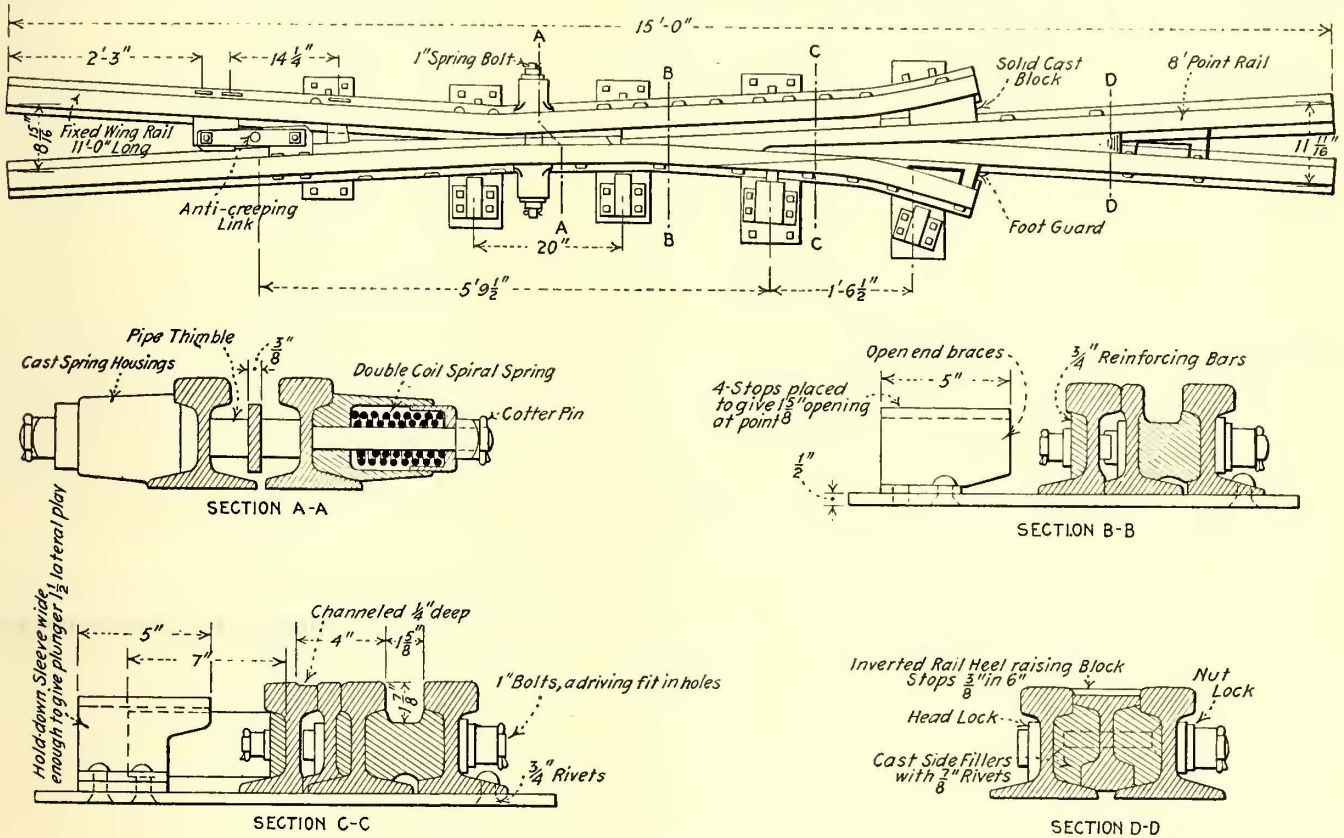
Track Construction and Maintenance—Construction of No. 9 Frog for Through Type Electric Siding
